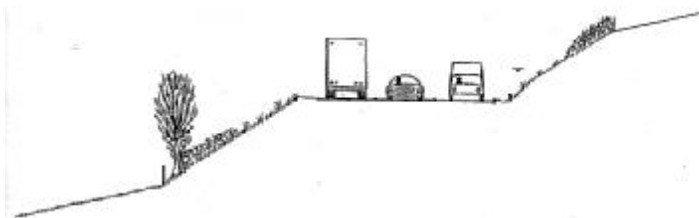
Typical cross-section of a modern A road (A361/A39 + other short lengths).
